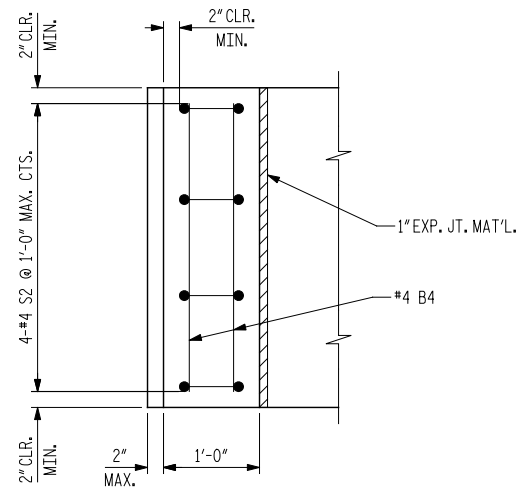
DETAILS SHOWN FOR FOOTINGS AND COLUMNS ARE TYPICAL.
